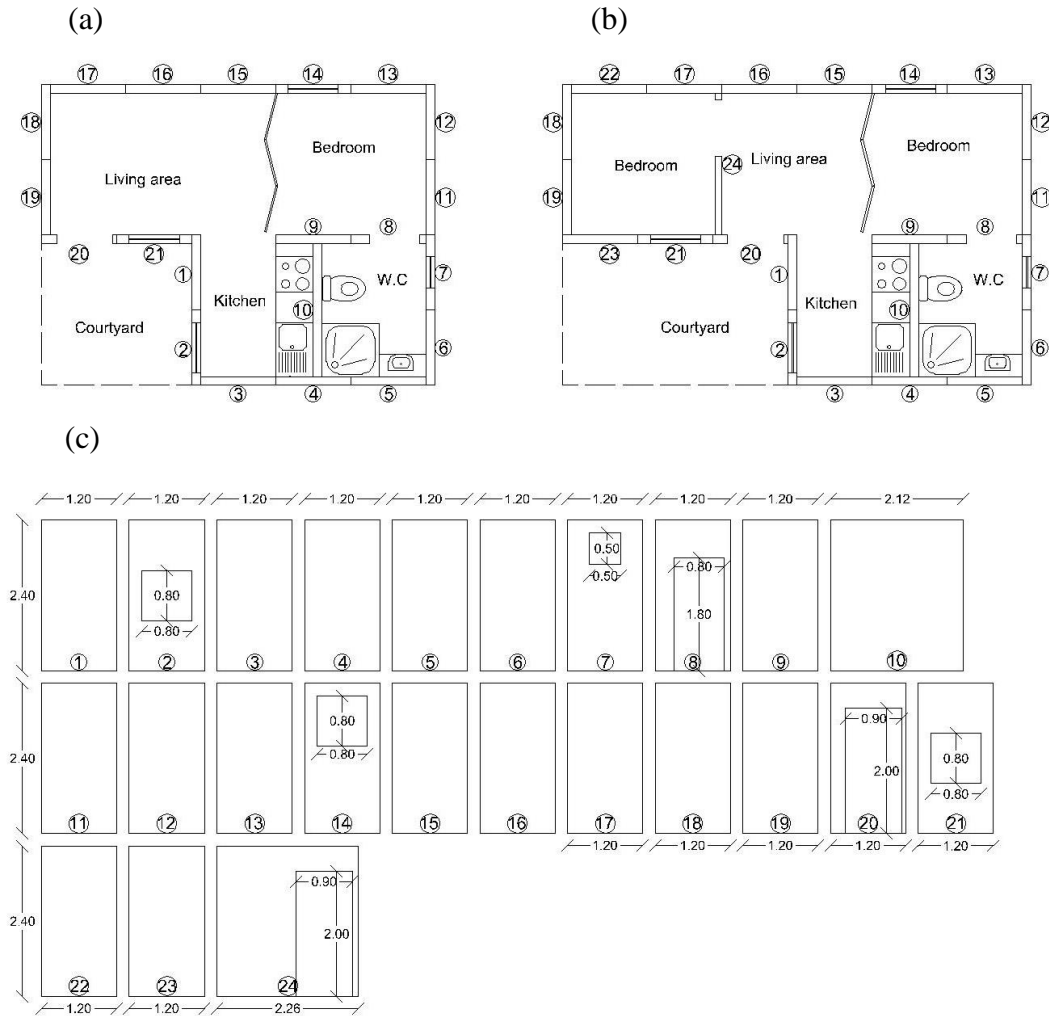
Concept 5- Panels arrangements: a) Basic plan with numbered panels, b) extended plan with numbered panels, c) Numbered panels for both plans
